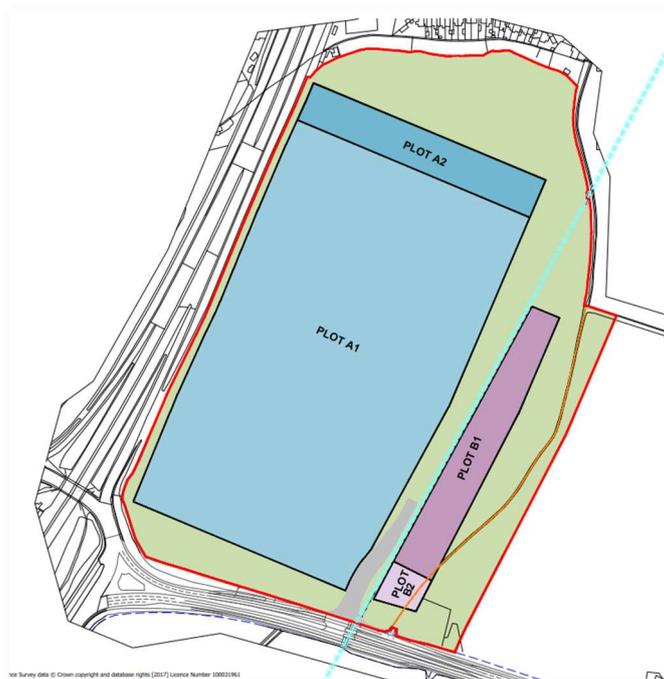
Plate V: The parameter plan (CD A5) prepared by Chetwoods showed a worst-case scenario of one large building (with a smaller building to the east), with a consistent roof height for Plot A1 of 117.8m AOD.
